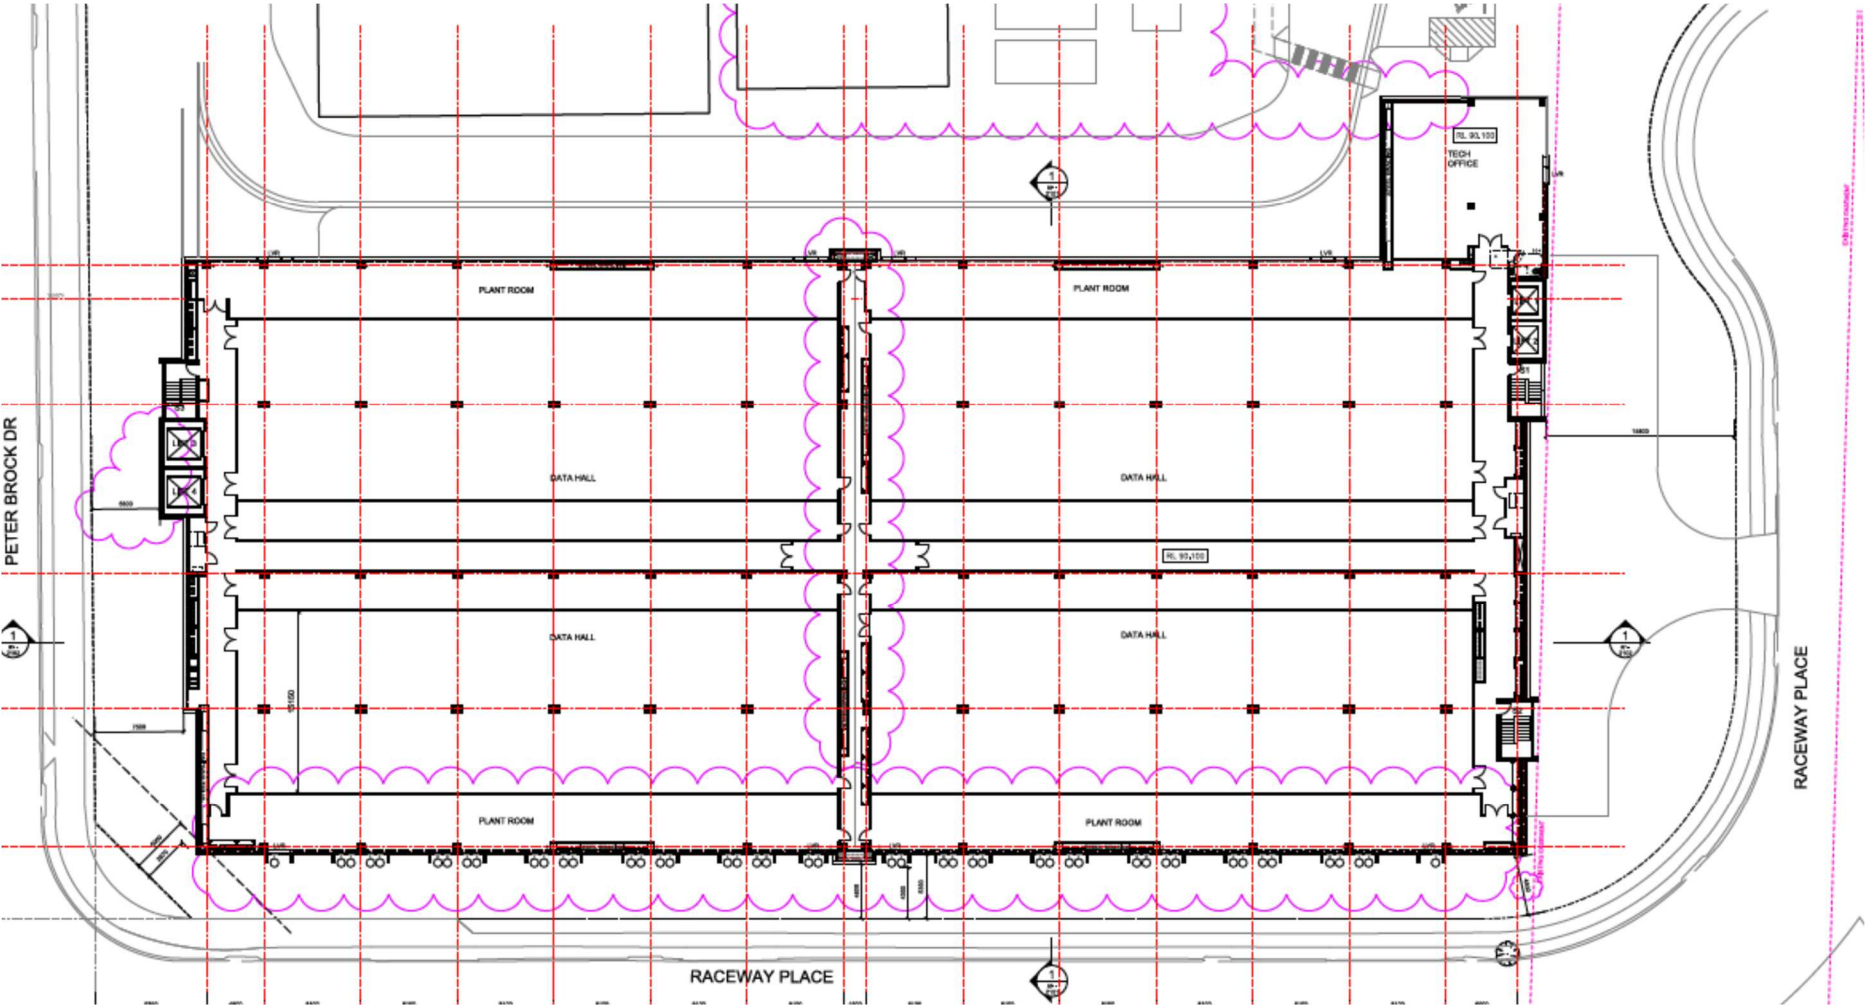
Level Three Floor Plan of the DCI SYD02 Data Centre.
